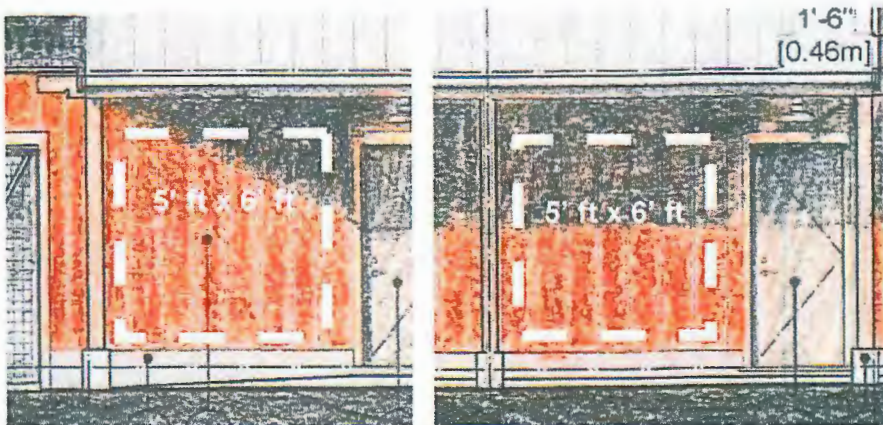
Showing extent of east and west wall areas on painted cementitious wall cladding on wood frame construction.
